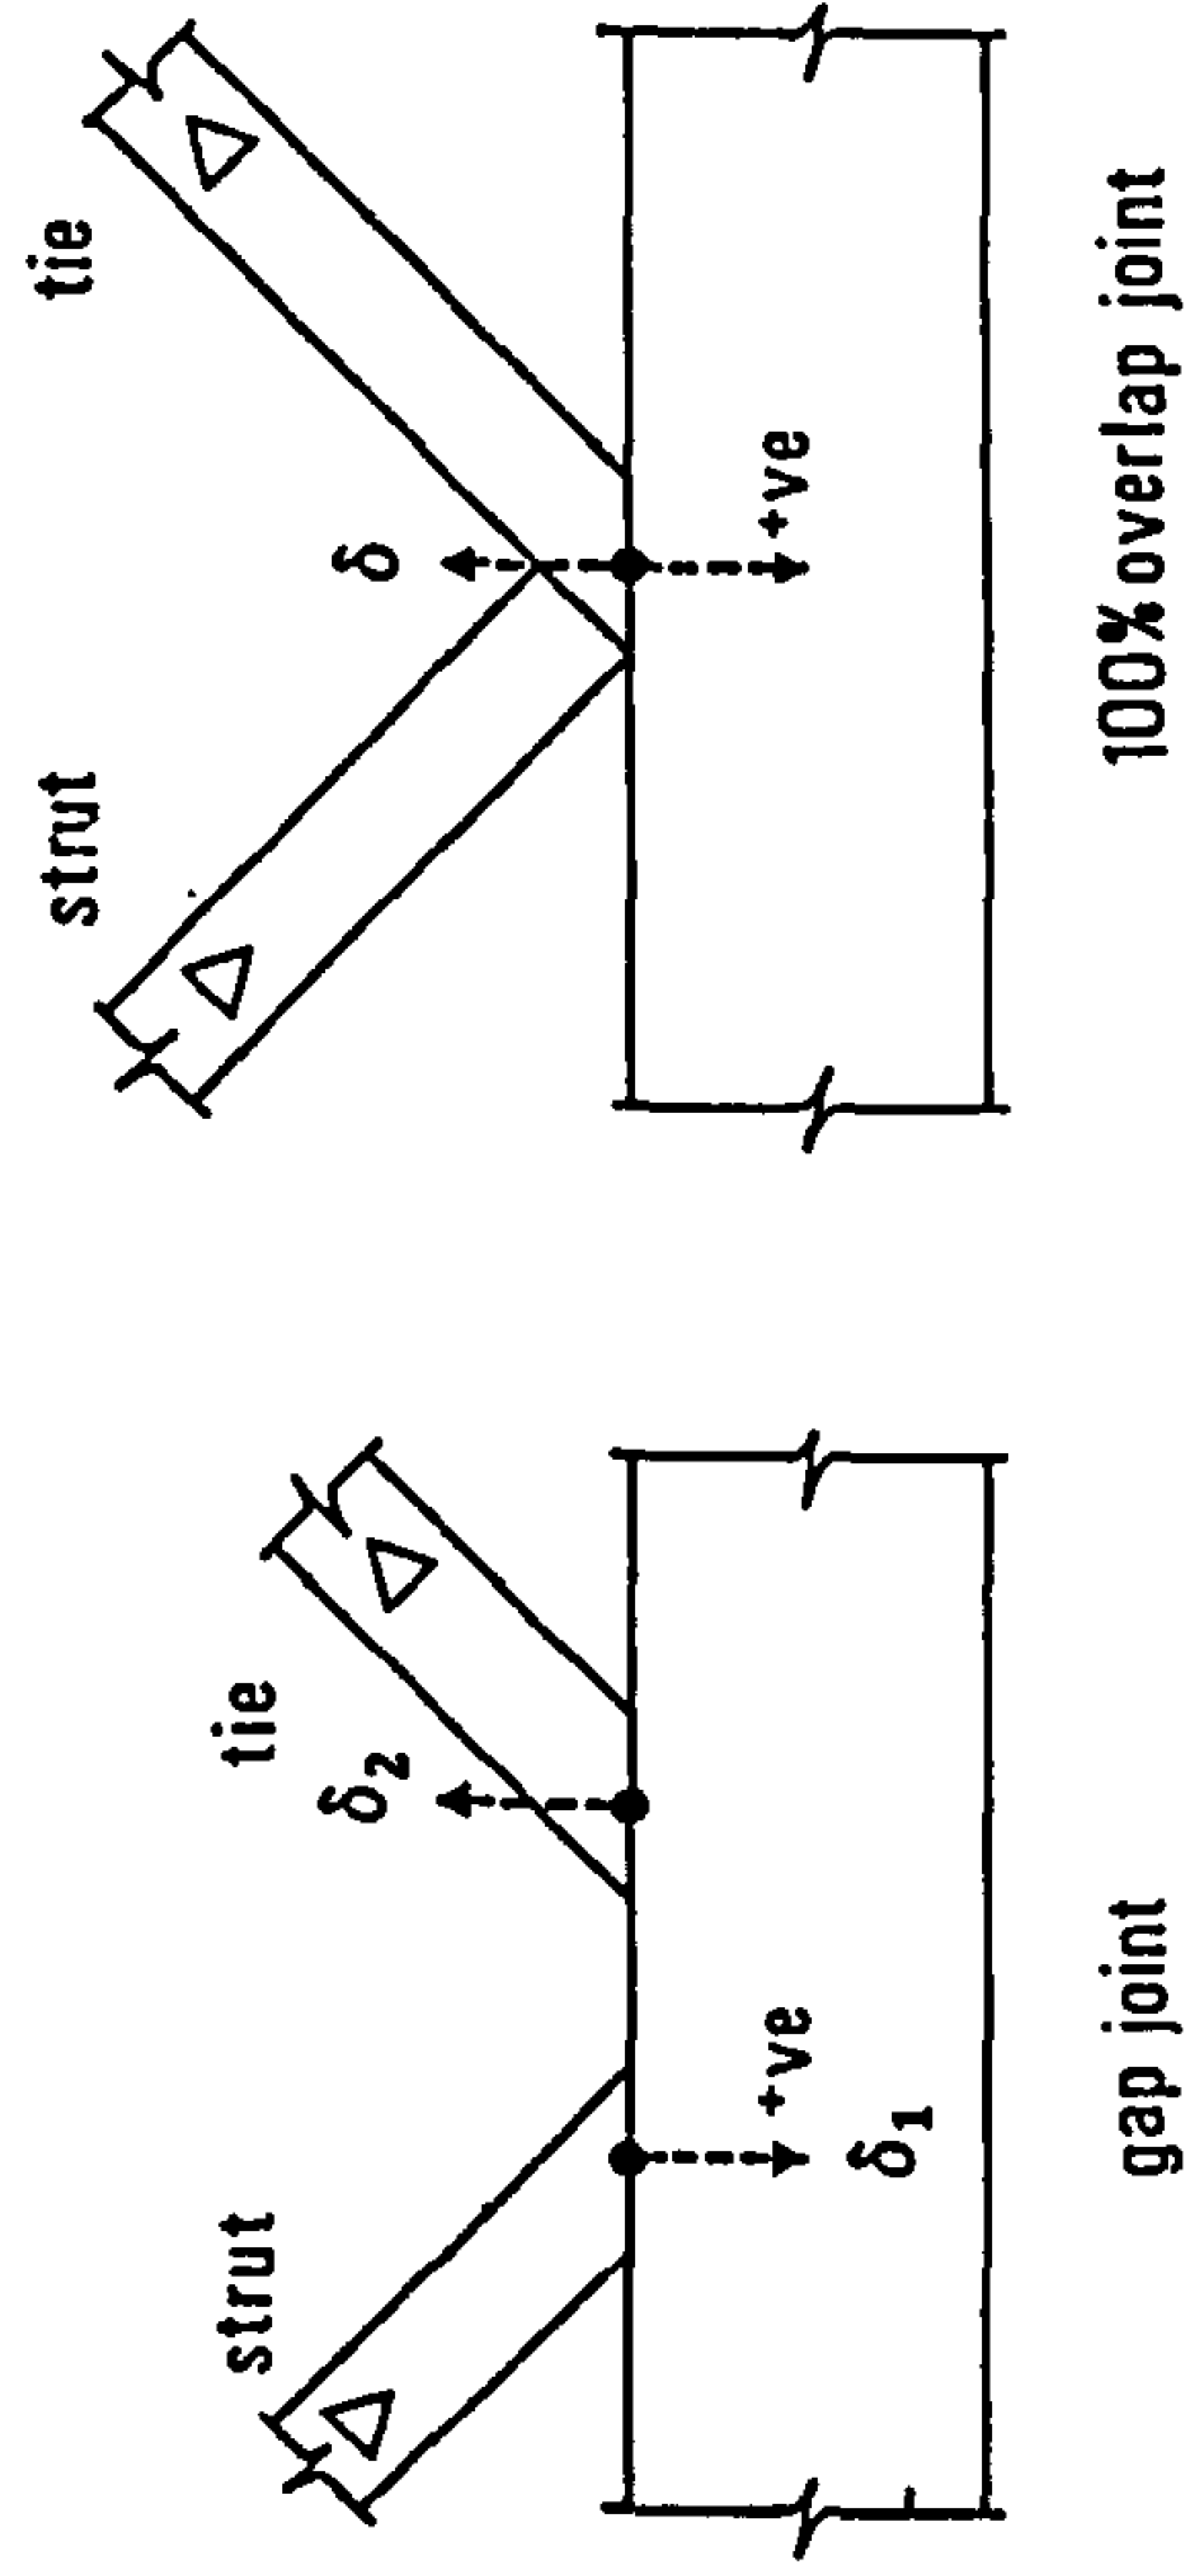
Comparison of local joint deformation for the gap joint truss T1 and the 100% overlap joint truss T2.
